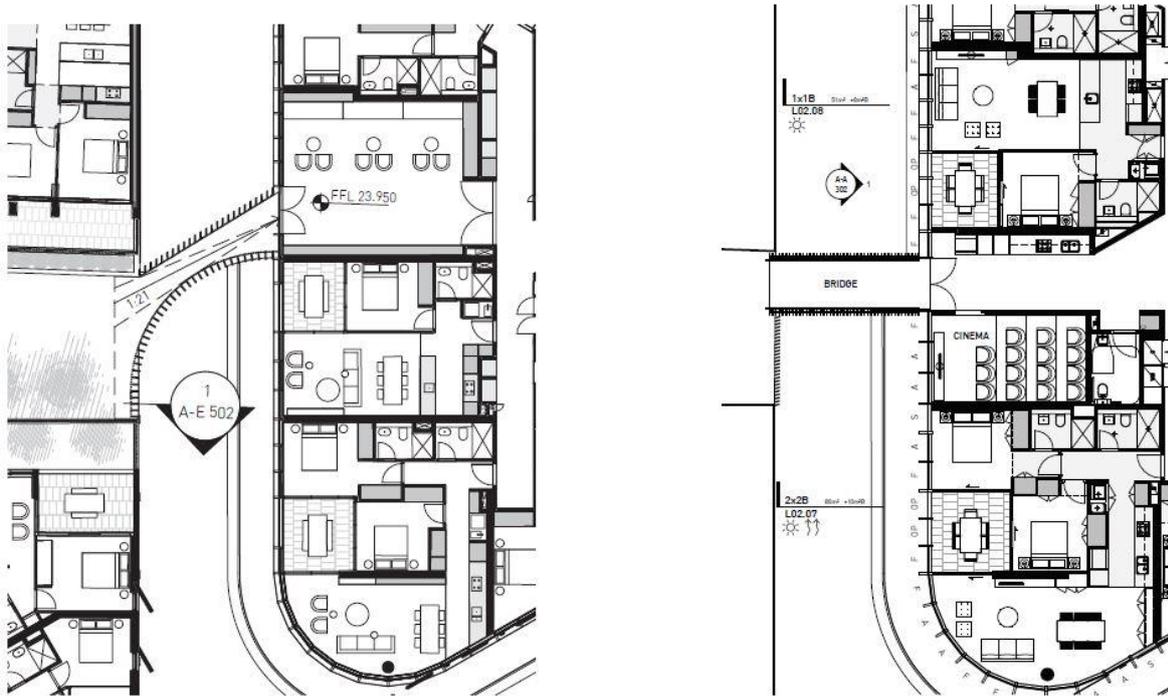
Change in link bridge design: as originally submitted (L) and as revised (R).
